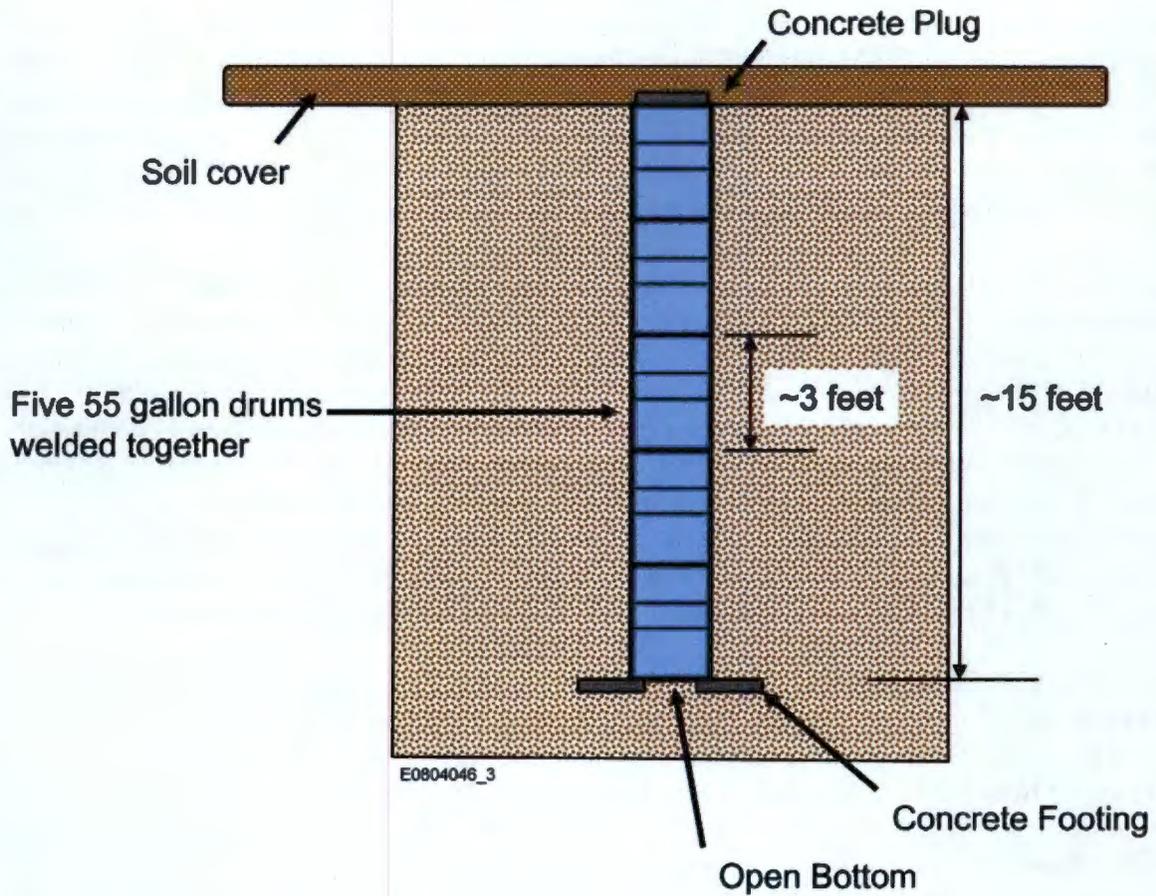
Typical 618-10 and 618-11 Site Vertical Pipe Unit.
